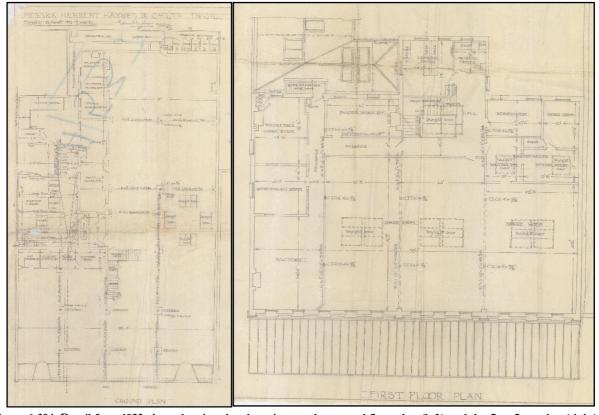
Detail from 1923 plans showing the alterations to the ground floor plan (left) and the first-floor plan (right) of Herbert Hayne's building (Wilson, 1923b).
